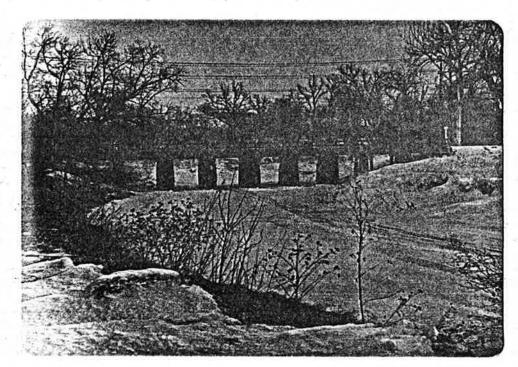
Timber railroad bridge located east of Wakeman Avenue.
